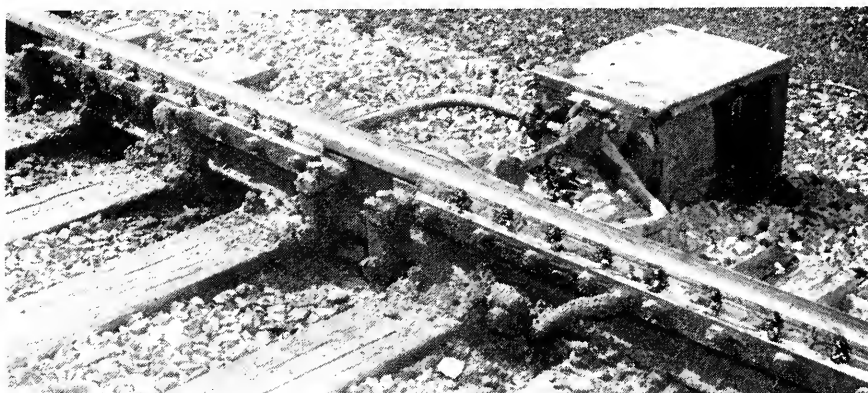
Meco rail lubricator, installed about one mile ahead of the test location.
